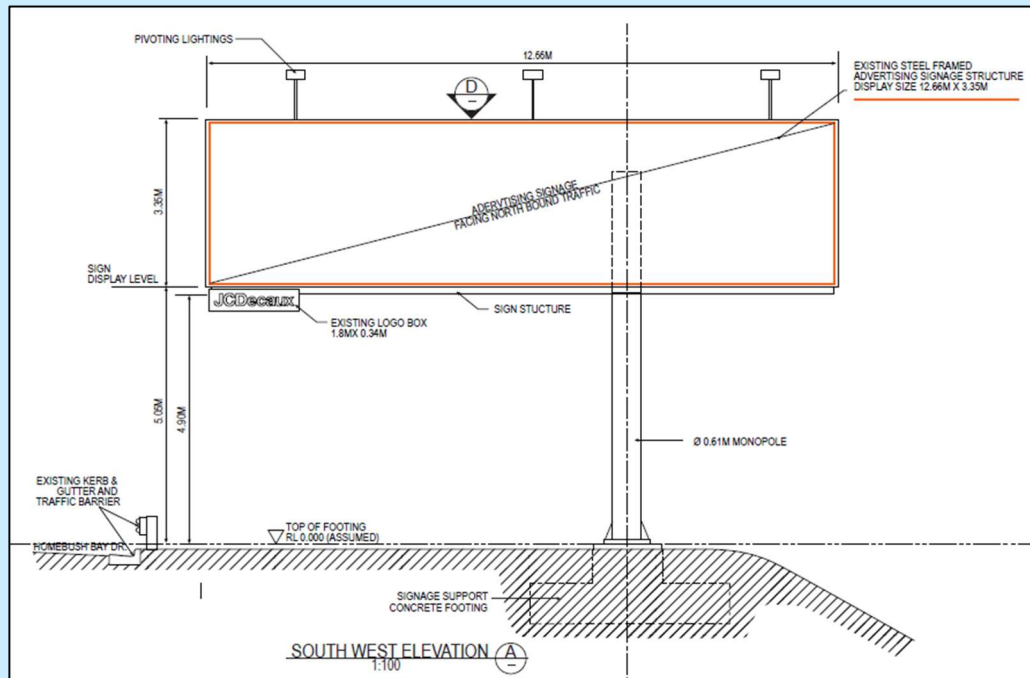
| Sign elevation – southwest (source: revised architectural drawings 2024)
